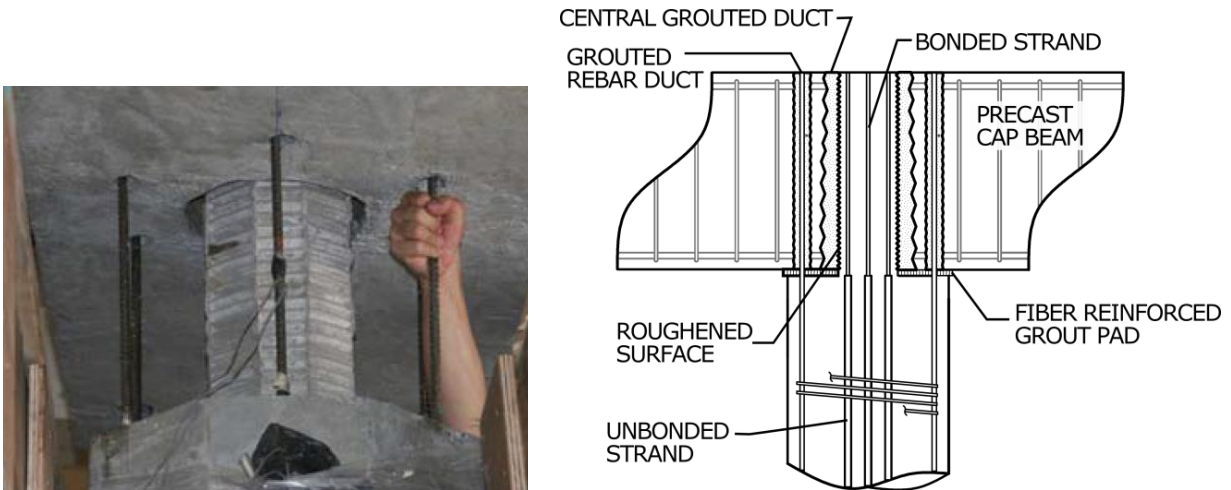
Modified grouted bar connection (adapted from Davis et al. 2015).
